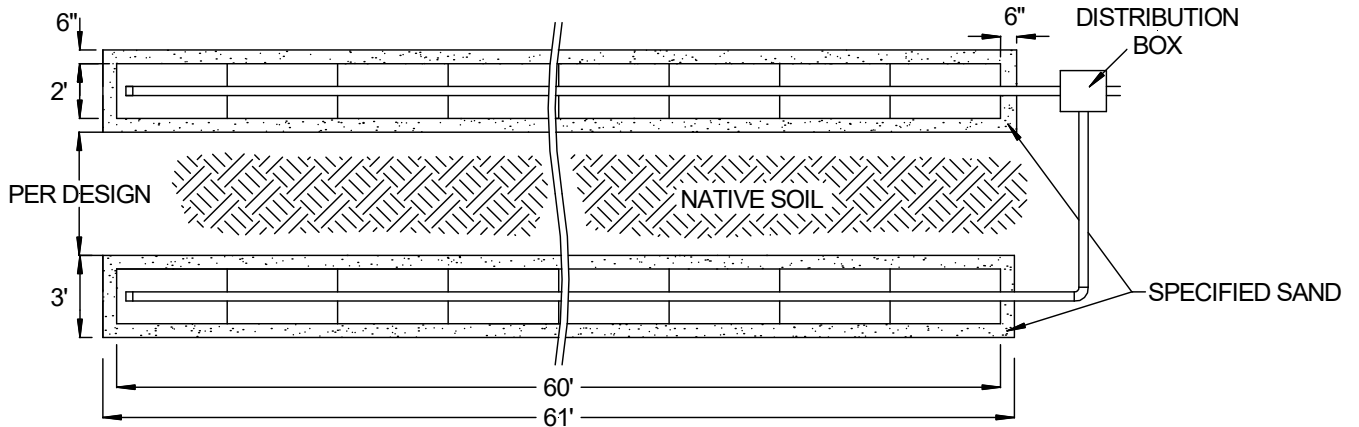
SECTION VIEW – A42 MODULES – TRENCH SYSTEM – LEVEL SITE
